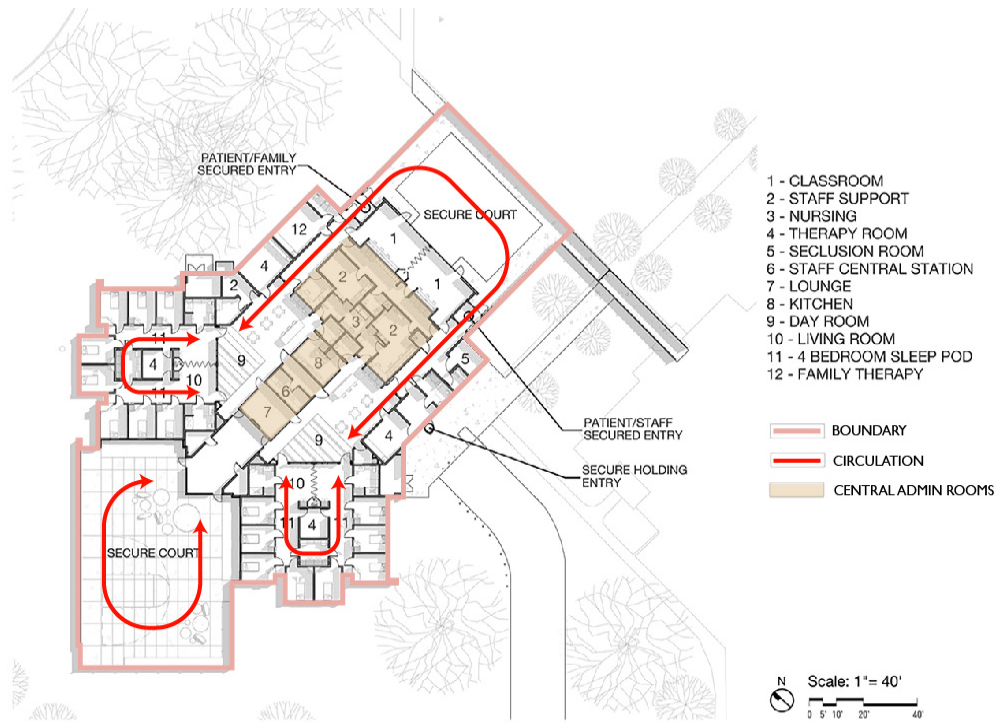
Plan View of Case Study Routing (ArchDaily, n.d)
